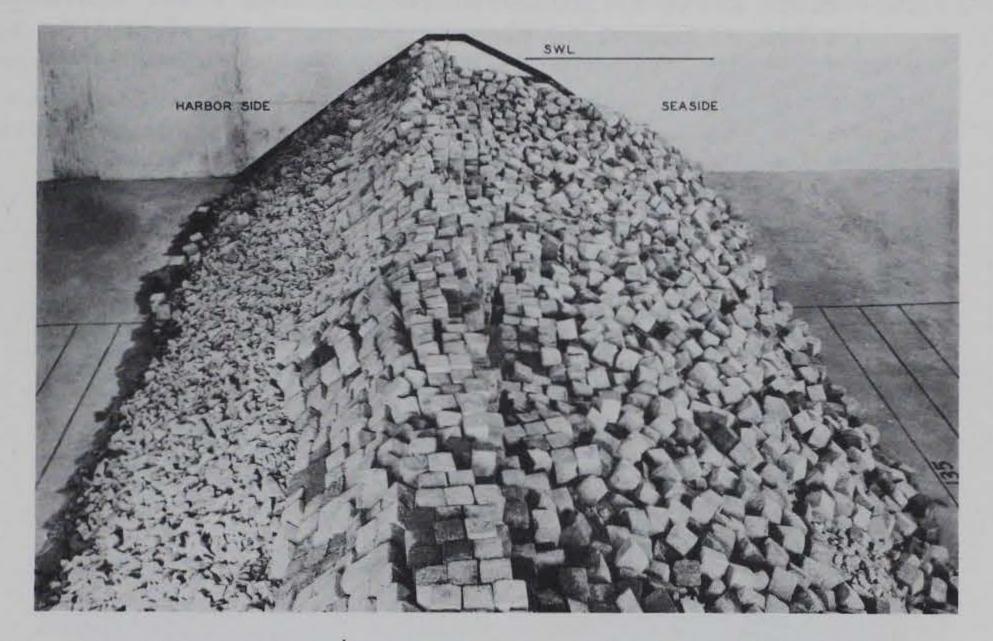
Test series 4, complete breakwater section after 15-ft wave attack, class A stone of molded concrete blocks
